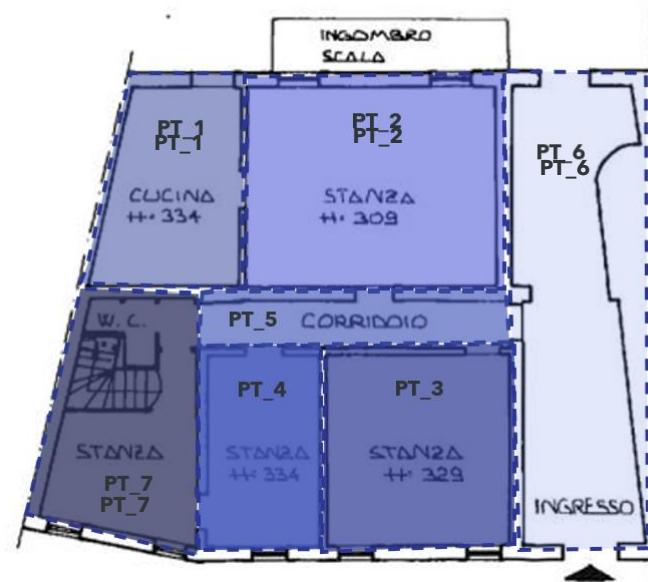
Detail of thermal zones with our nomenclature (Ground floor).
